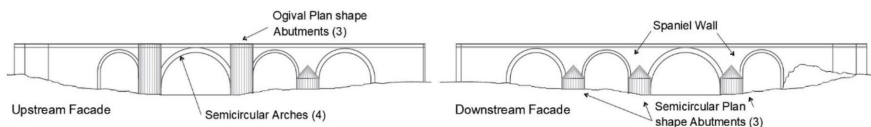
Left, Upstream Façade Las Donadas Bridge. Source (Author 2018) Right, Downstream Façade of Las Donadas Bridge. Source (Author 2020)
